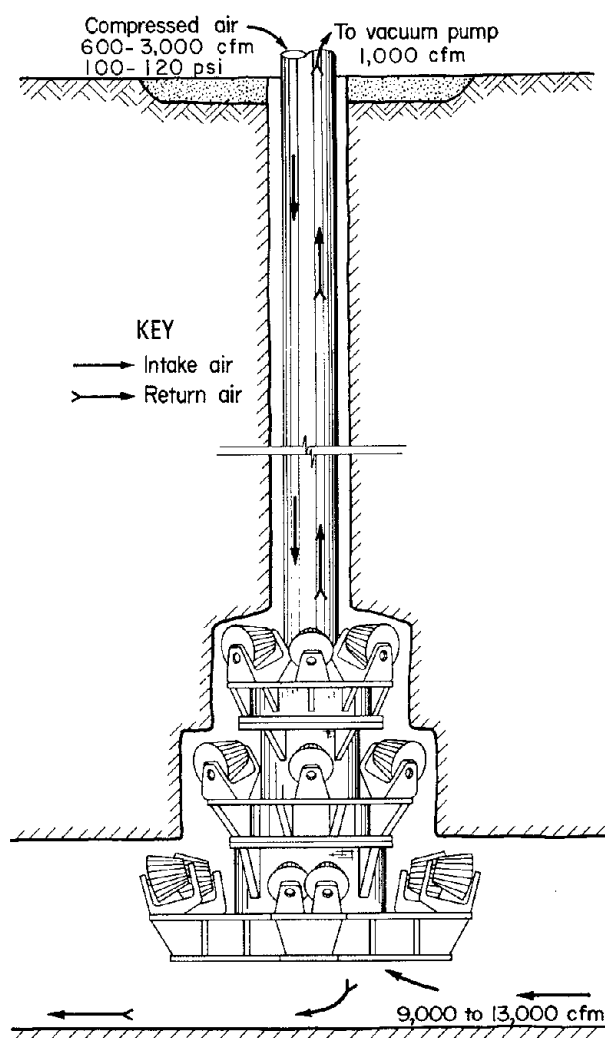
Alternate use of air compressors and vacuum pump for shaft ventilation.
